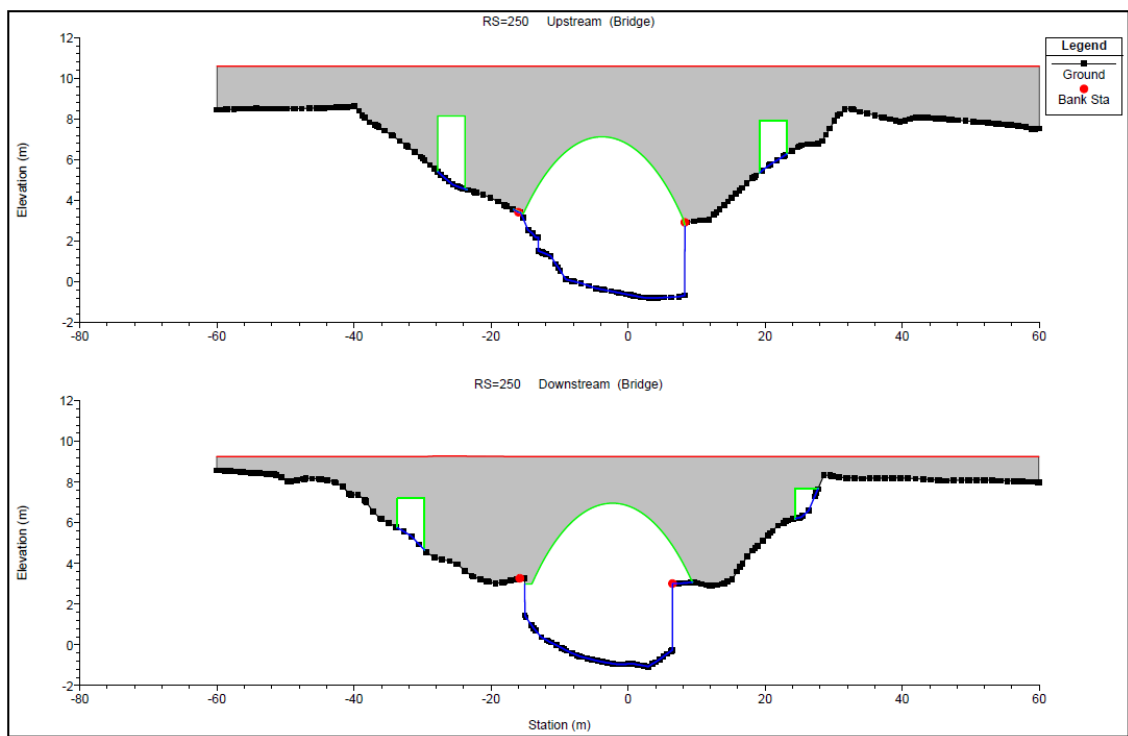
Lennox Bridge Section in HEC-RAS model
